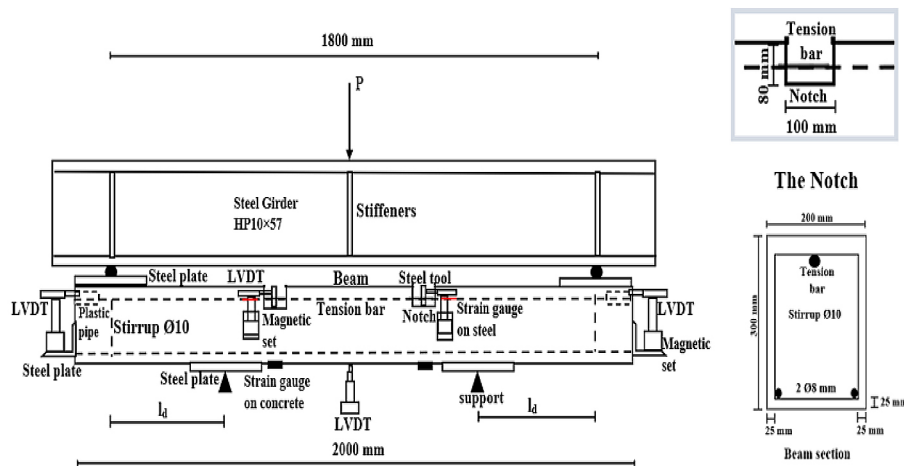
Illustrates the shape and arrangement of the beam, the experimental configuration and reinforcement details
